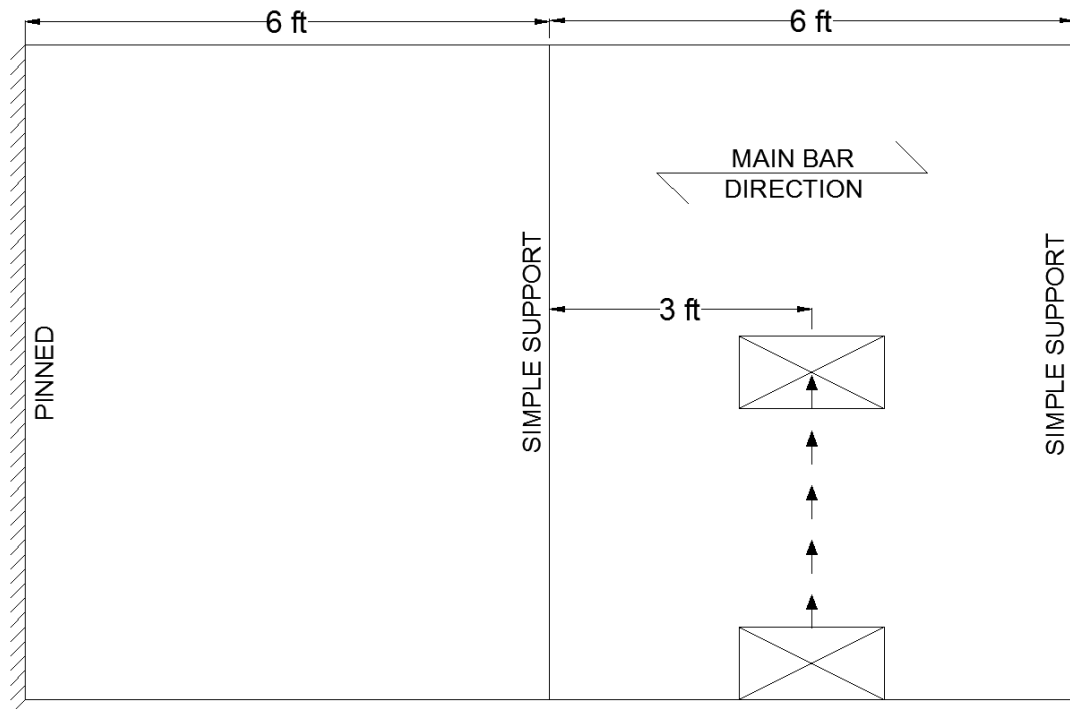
Plan view of specimen 4.0RECT2.5TYP4 setup to investigate weak direction stress
